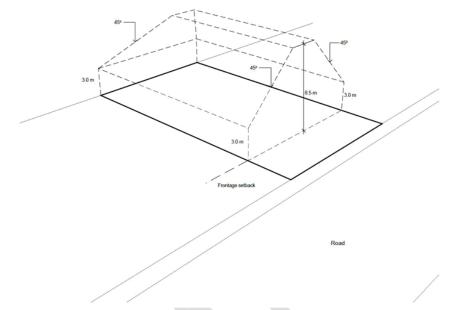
Building envelope as required by clause 10.4.2 A3(a)
